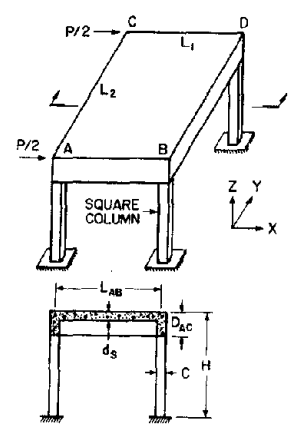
SINGLE-STORY, SINGLE-PANEL FRAMED STRUCTURE
